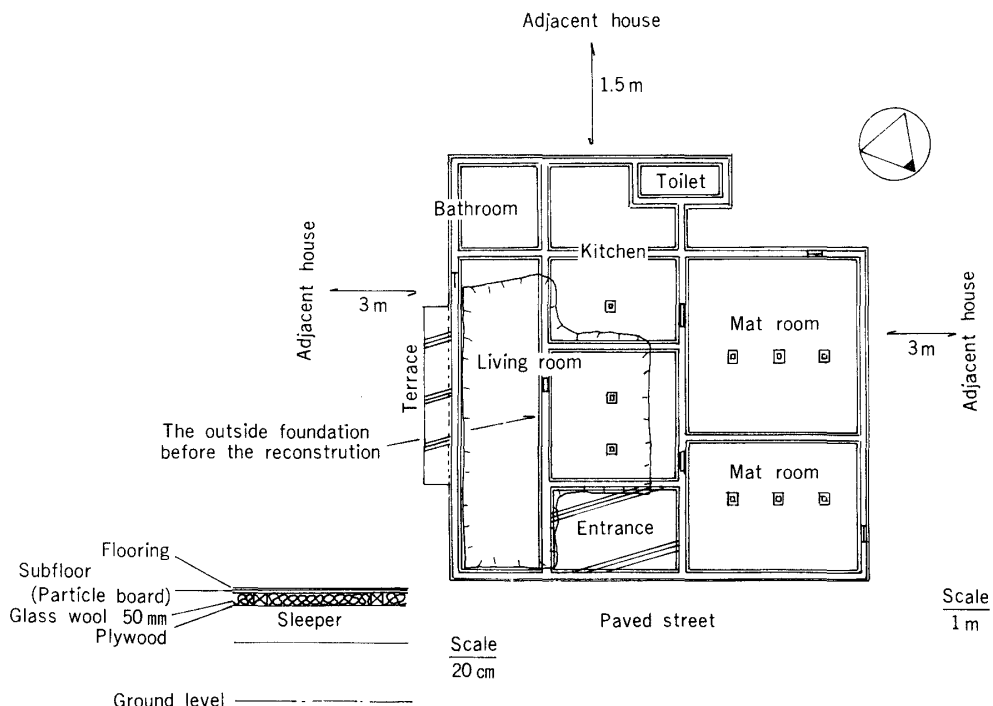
The foundation plan and the details of the floor constitution (Case 7).
